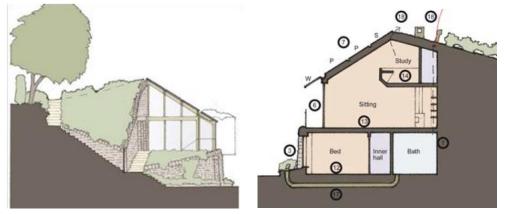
(a) West Elevation; (b) Cross Section with southern roof orientation
